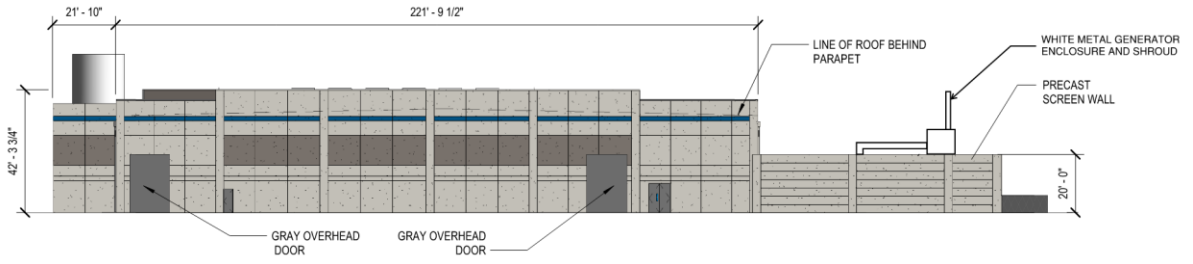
Elevation view of a typical "end cap" barrier wall ("Precast Screen Wall").
